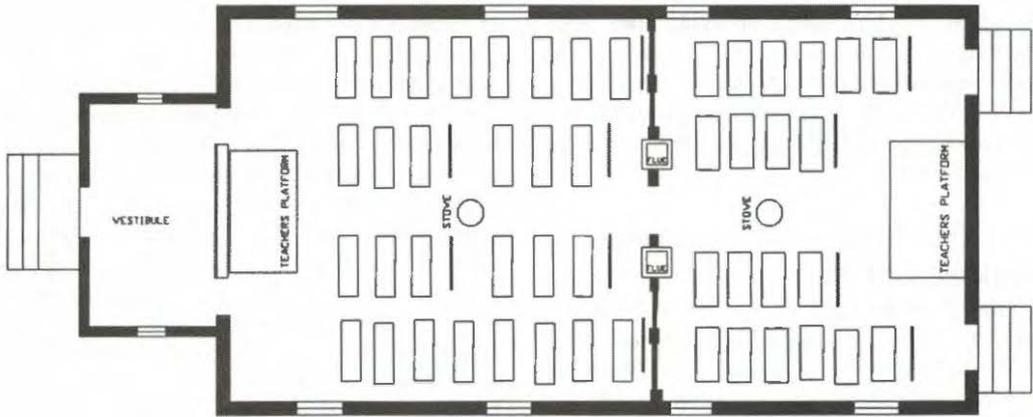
Van Bokkelen's 1865 plan for Schoolhouse No. 5.
